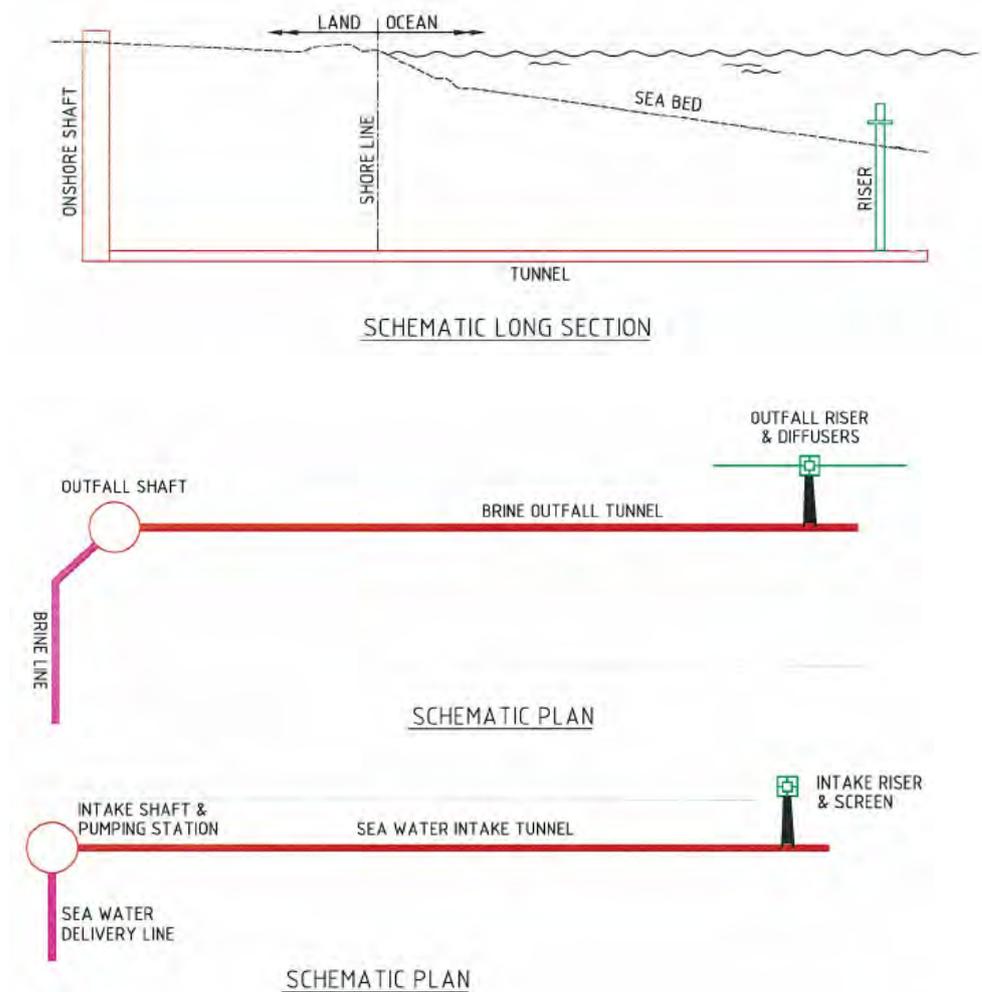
Proposed outfall (a and b) and intake (c) pipeline plans
